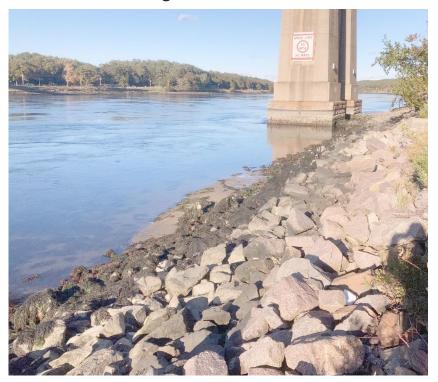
Banks of Cape Cod Canal Adjacent to Bourne South Quadrant Bridge Piers, Looking East (closeup view)
